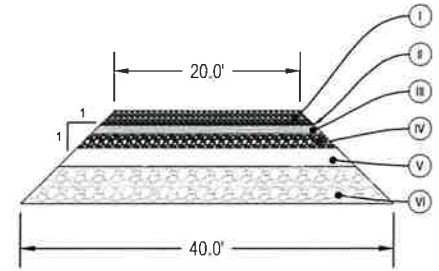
EXHIBIT A: Preliminary Plan and estimate for access road construction for the extraction of District Excavator.
